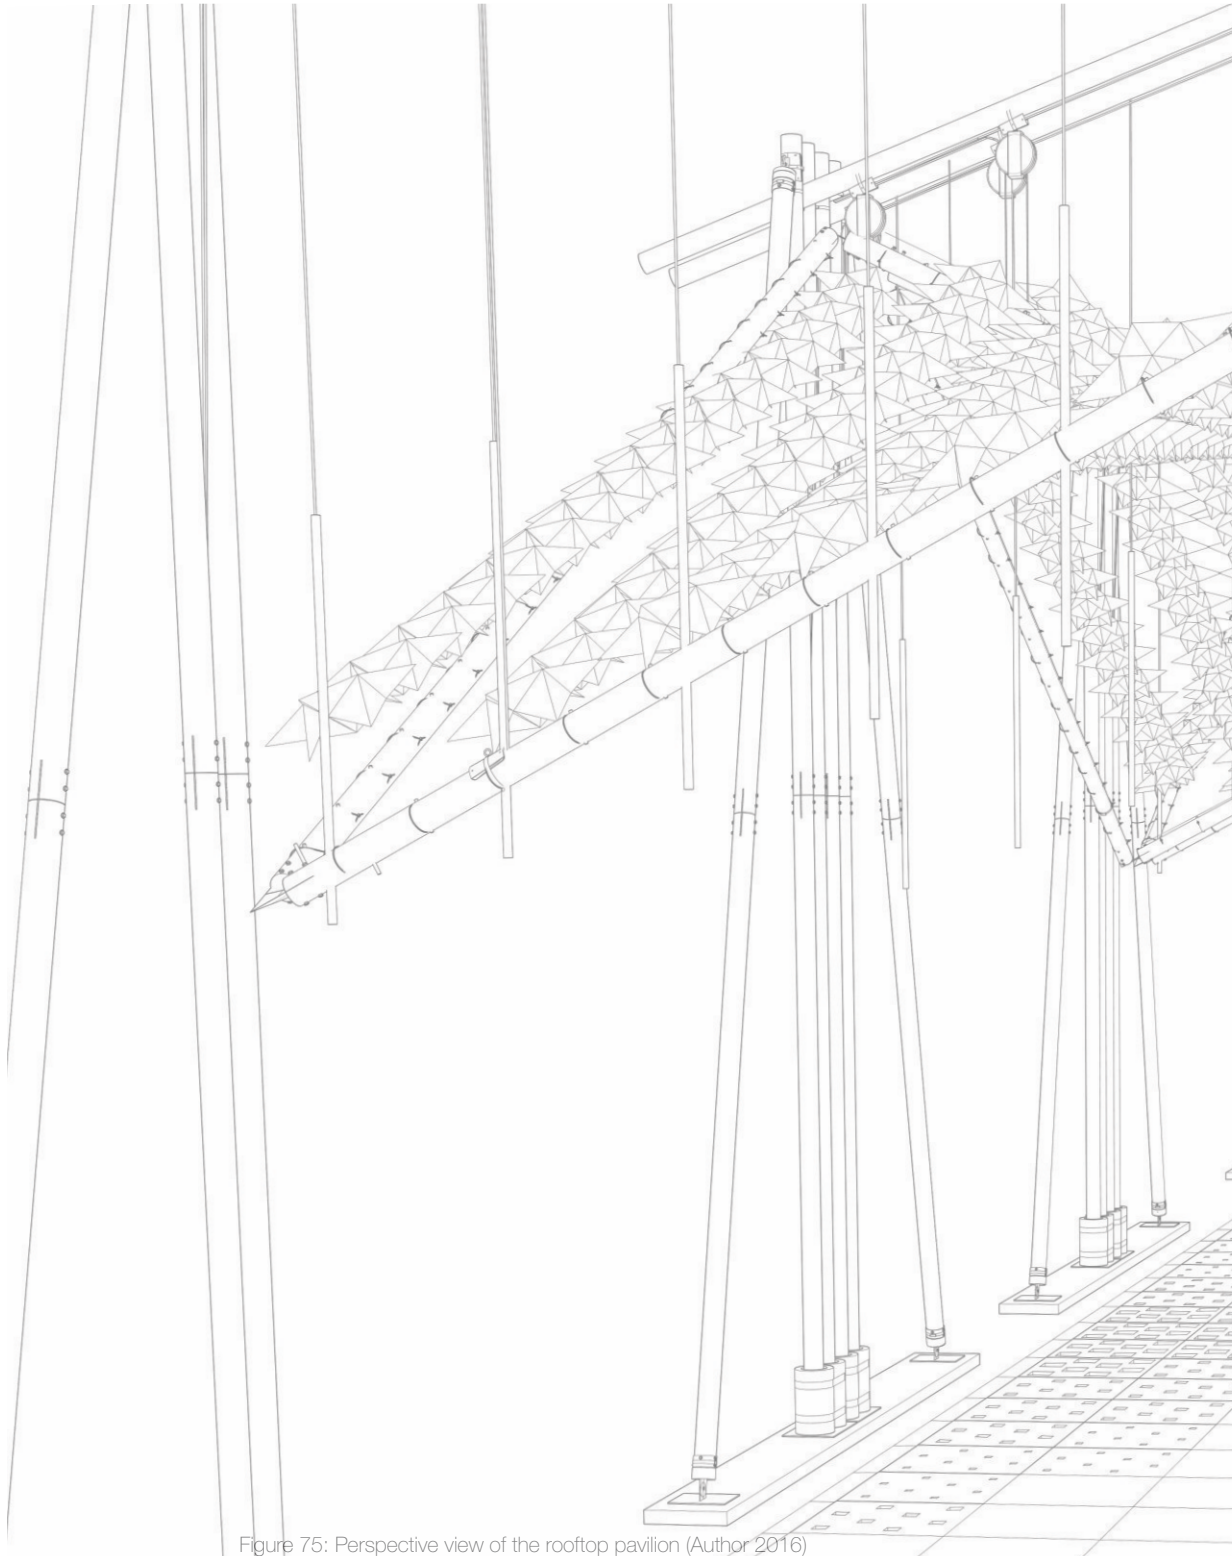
Perspective view of the rooftop pavilion (Author 2016)
